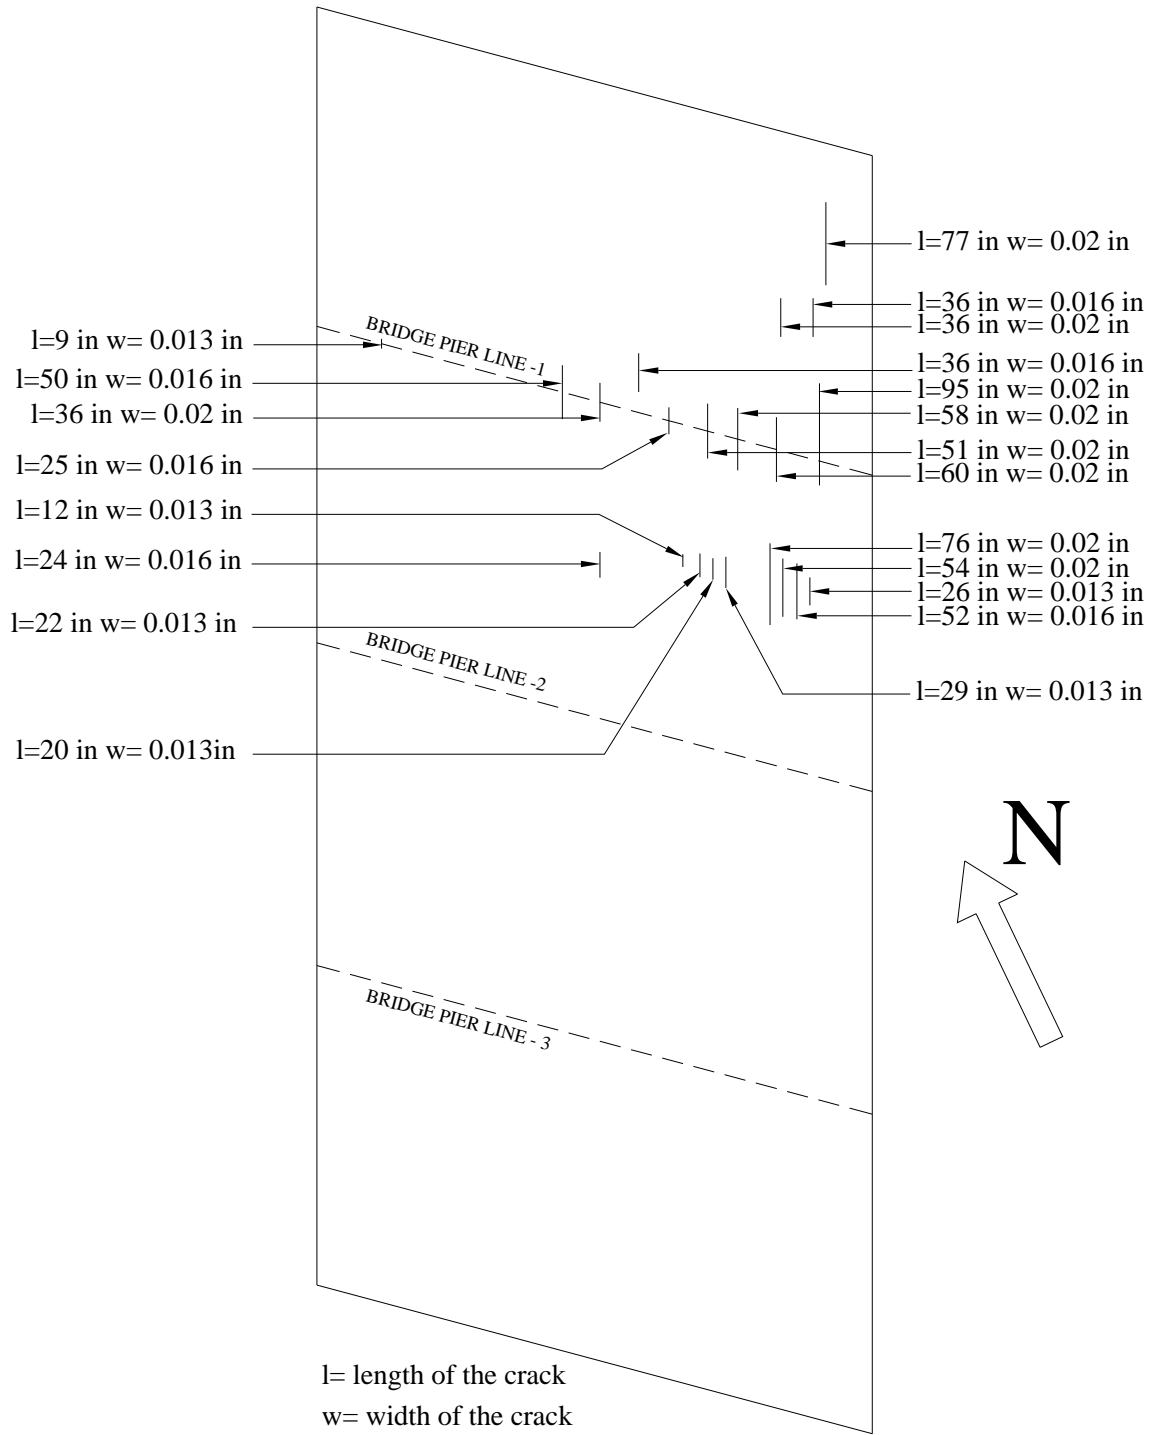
Bridge deck 5500 new cracks between 28 and 56 days.
